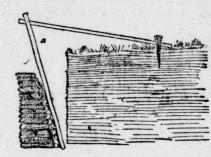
PROPERLY CONSTRUCTED WALLS. This will give a width to the wall of
